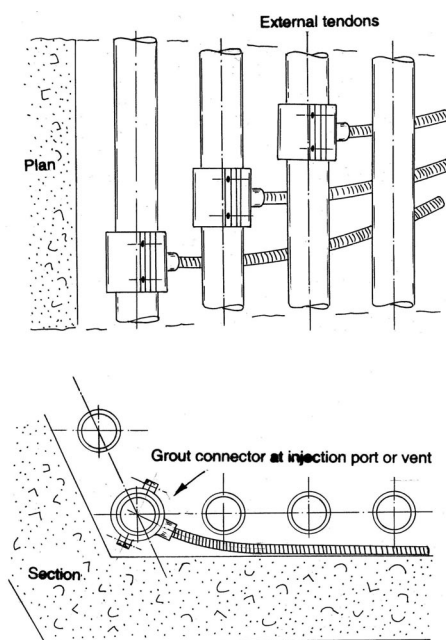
Grout Port and Drain Connections for External Tendons
